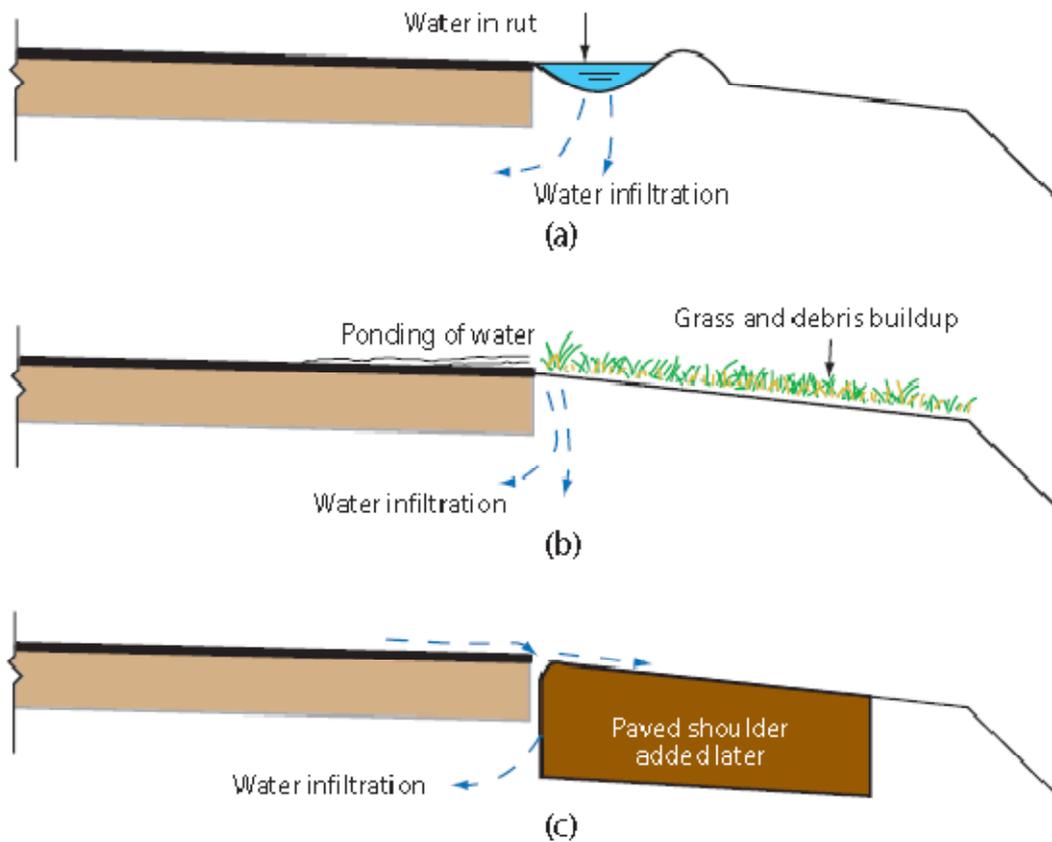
Typical drainage deficiencies associated with pavement shoulder construction.
